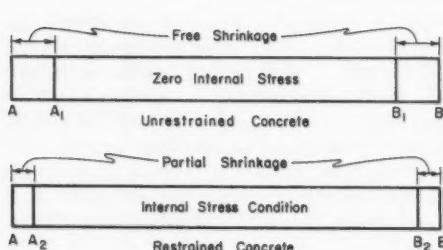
EFFECT OF SHRINKAGE ON A PORTION OF CONCRETE PAVEMENT BETWEEN CRACKS
